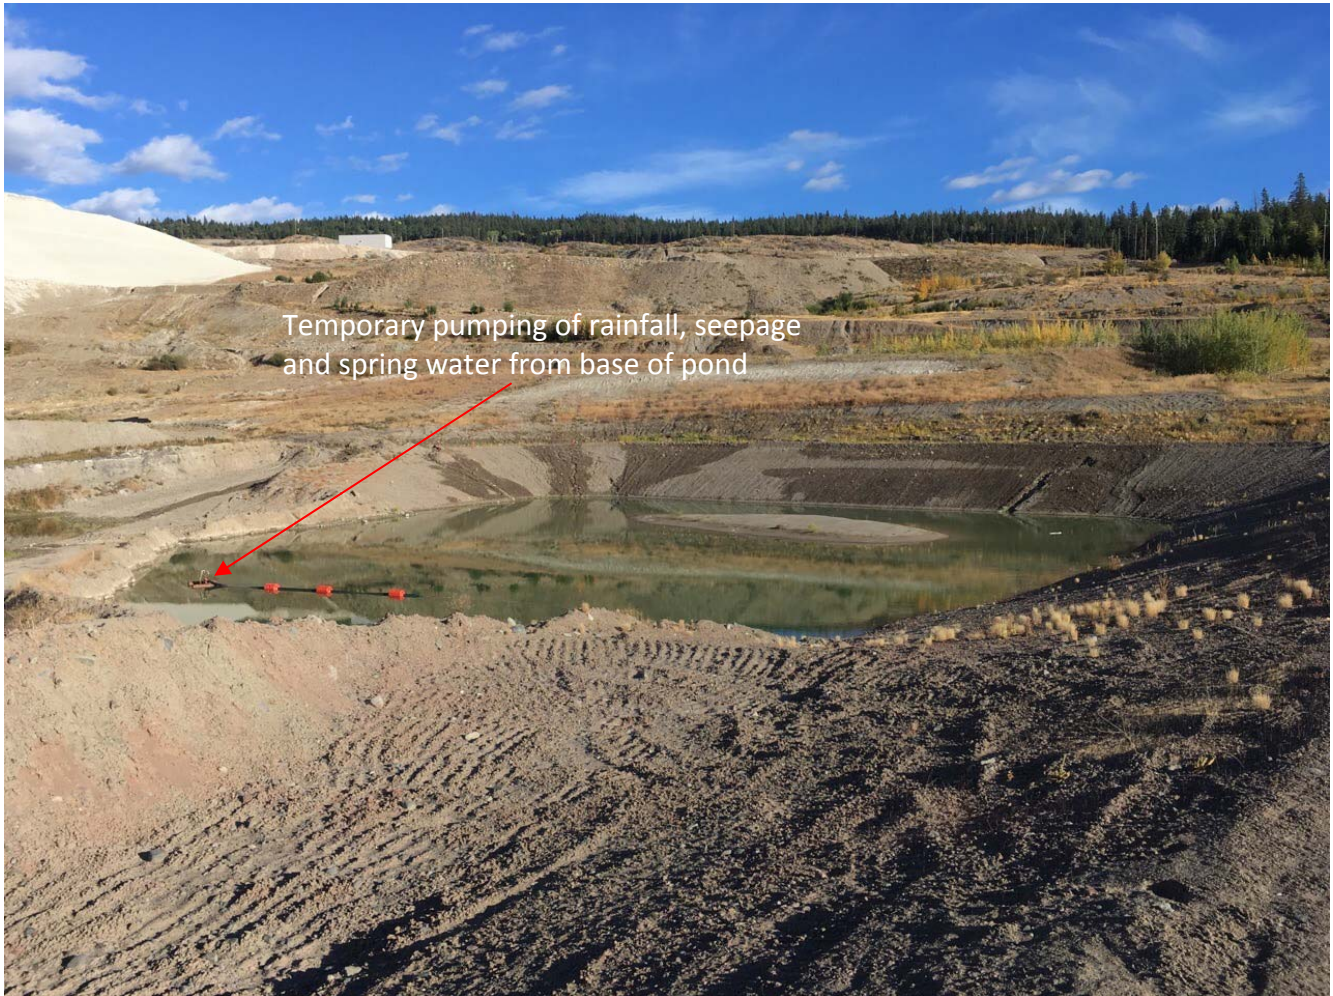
Slimes Pond 3 (partially constructed) – Ponded Water on Crest from Spring Lines in Slope – Facing East (SS-2017-11)
